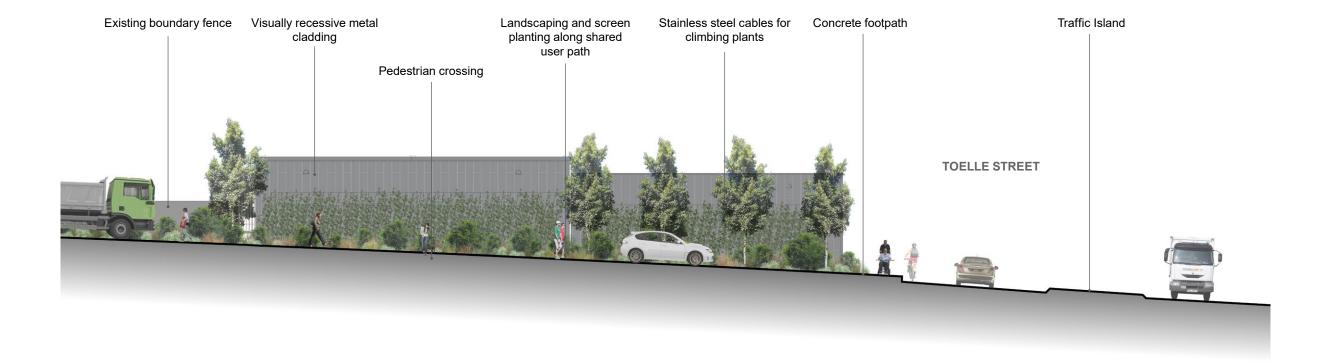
ICL Surface Fixed Facility - Elevation 2
